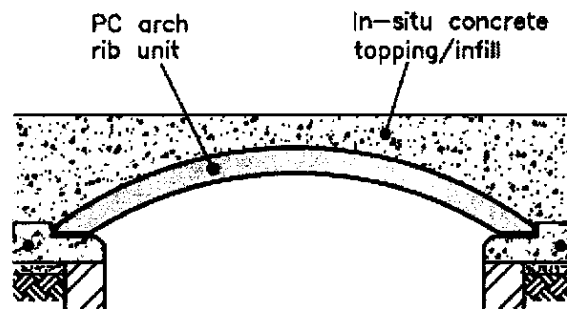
PC Arch Rib Unit with In-situ Concrete Topping
